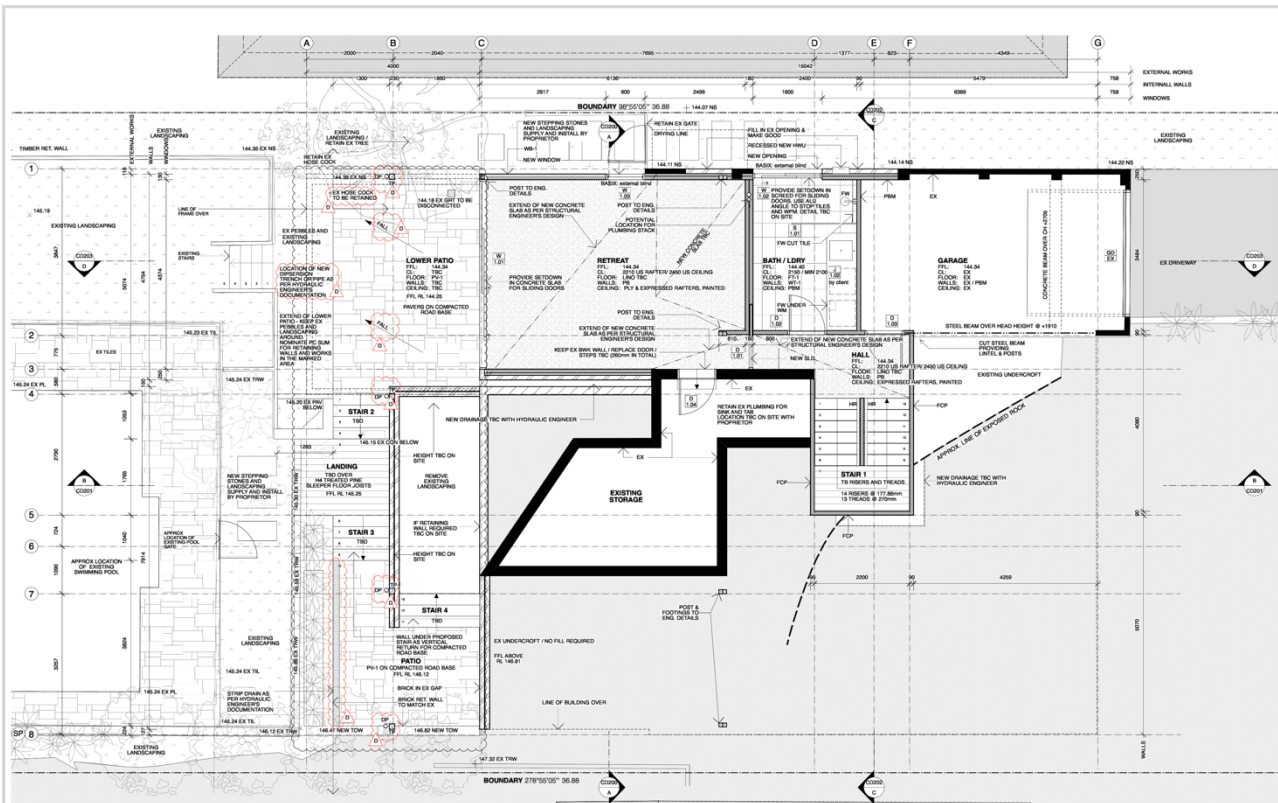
CDC Lower Ground Floor Plan 11 Jones Street, Beacon Hill
